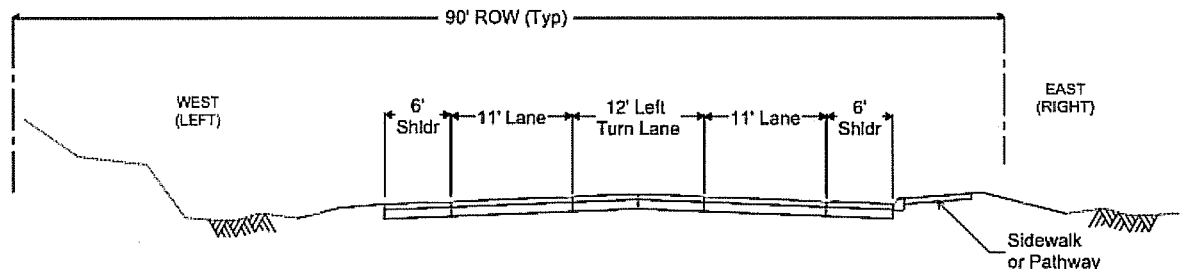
Typical section with adjacent sidewalk or pathway, east side only
